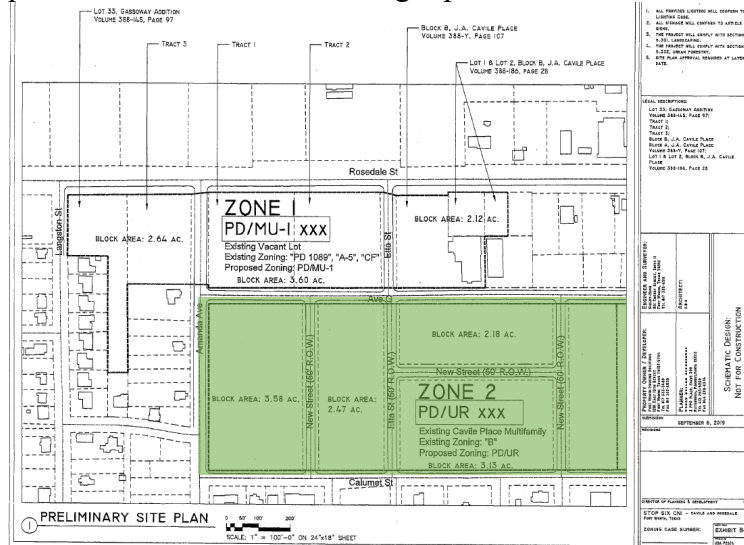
PD 1260: Preliminary site plan that was submitted. Highlighted area indicate the zone for the new proposal and area of requested waiver.
